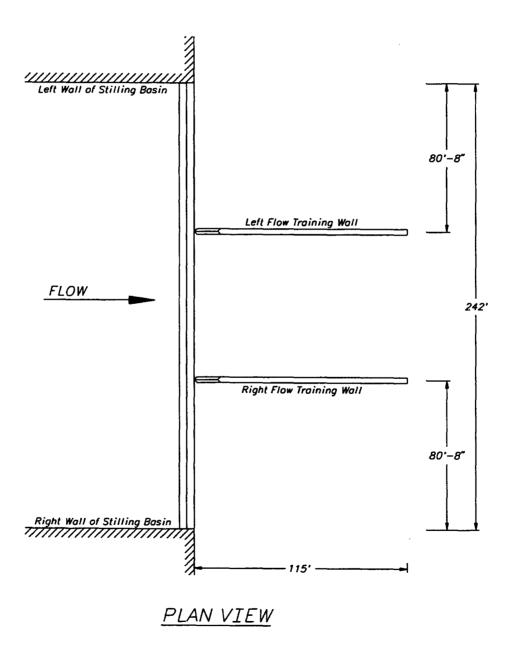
Structural modification #4, flow training walls added to exit channel.
